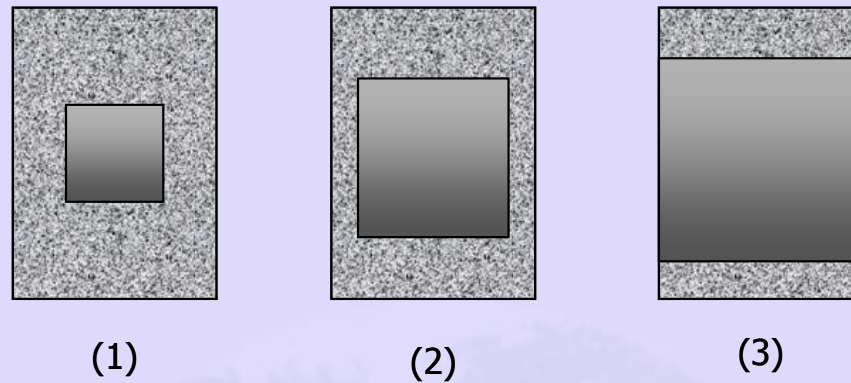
End views of end zones with varying size of the bearing plate
